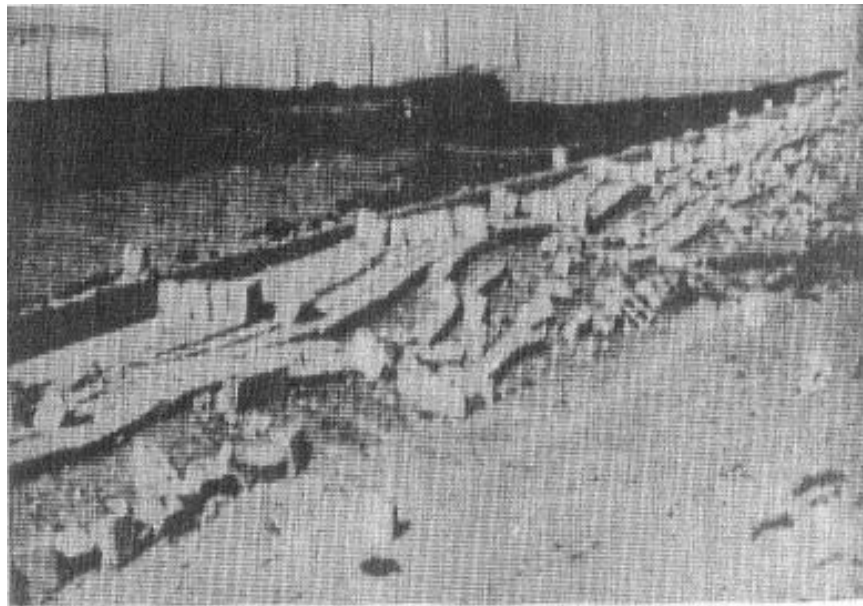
Damage to adobe walls and hut from seismic loading resulting from the Chimbote volcano eruption.
